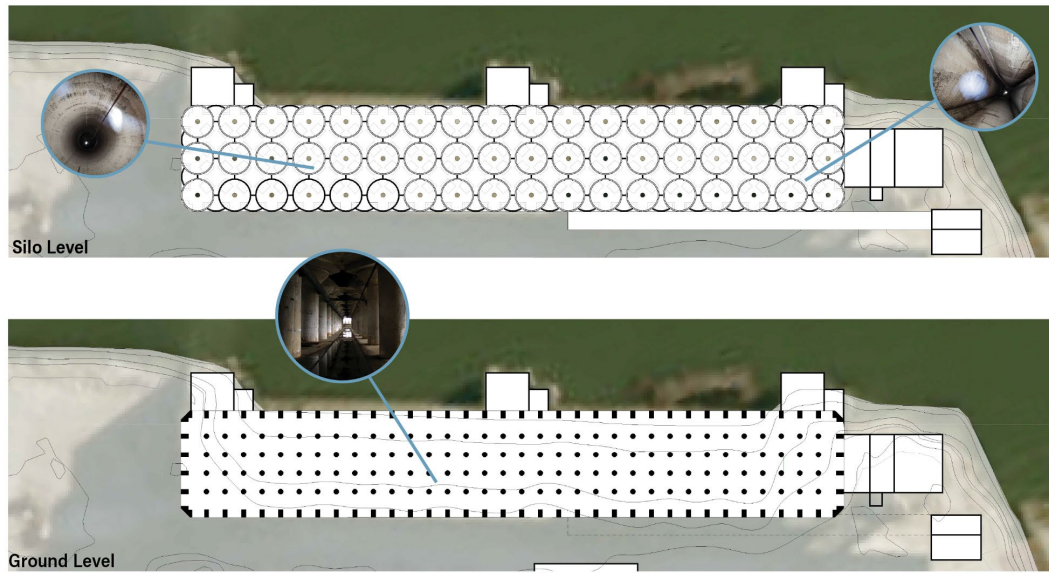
Approximate existing plan conditions with on-site photos. Image Credit: Author
